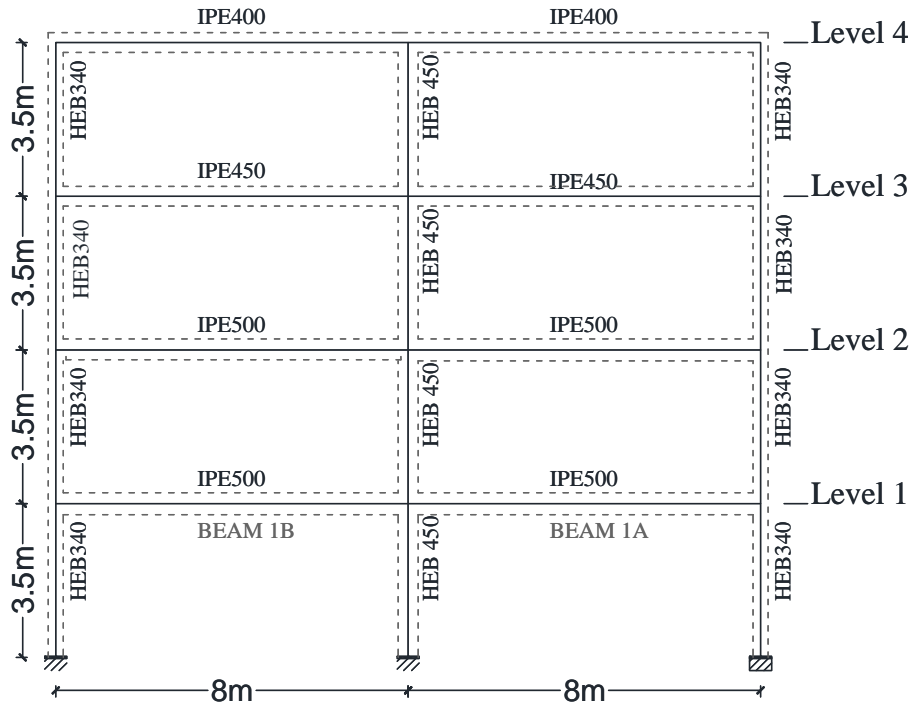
The cross-sections of the typical frame according to the design for seismic and gravity loading.
